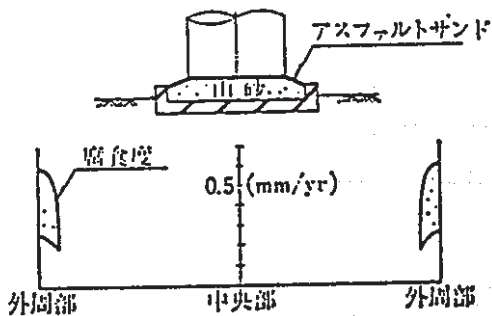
Corrosion of Bottom Plate of Tank Lined with Asphalt Sand
